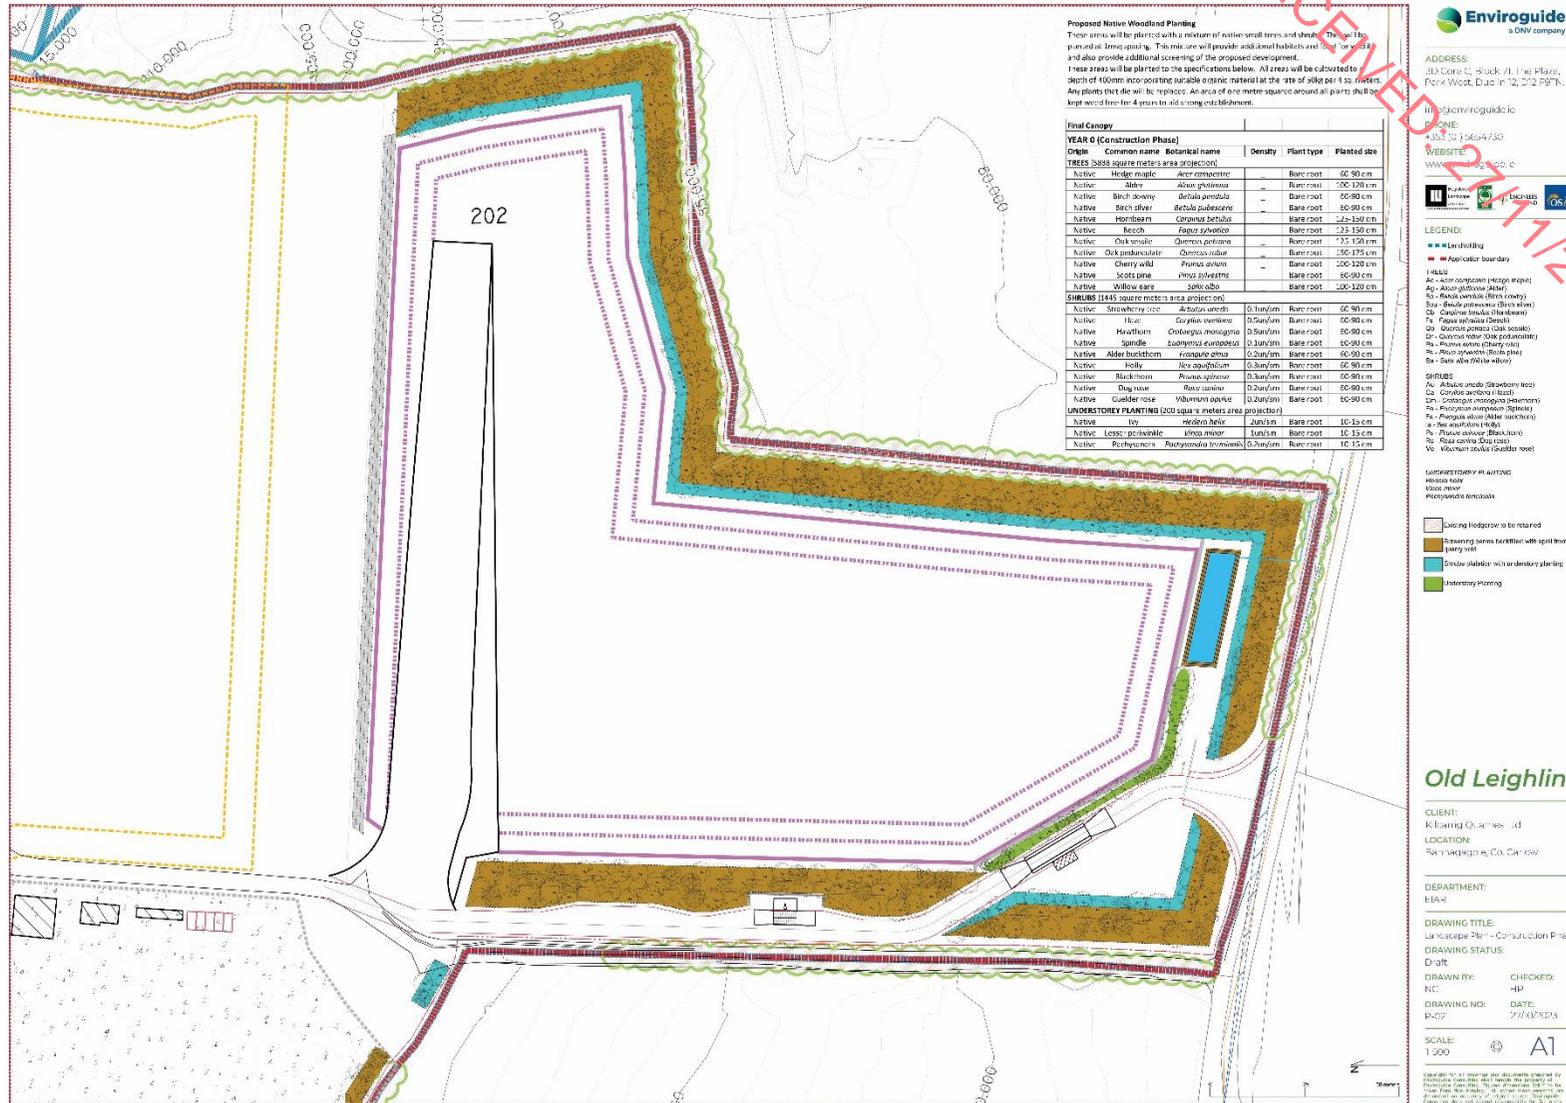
Proposed Landscape Plan (Construction Phase)
